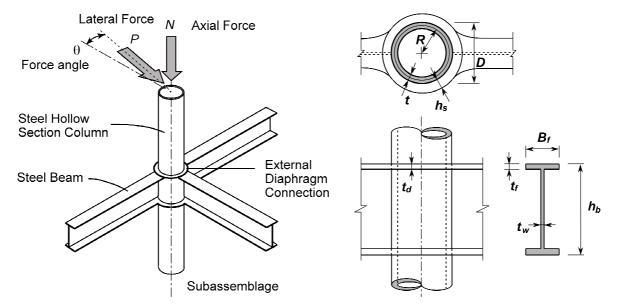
Subassemblage with external diaphragm subjected to increasing lateral force and constant axial force at the top of the column.
